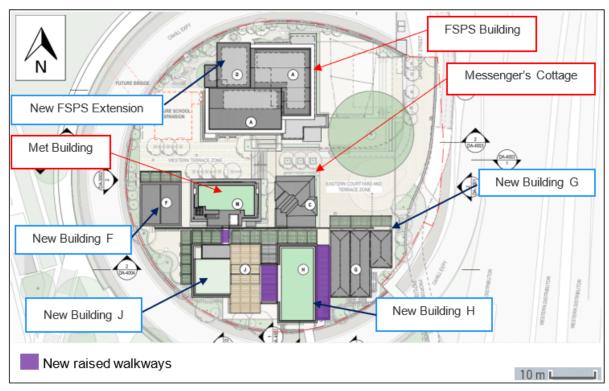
| Proposed Site Layout (Base Source: Applicant's EIS 2020)
